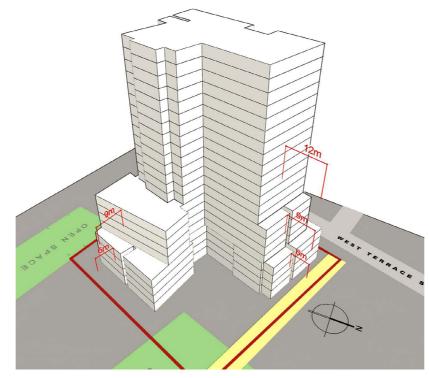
Building envelope - view looking south west (Source: Tony Owens)
